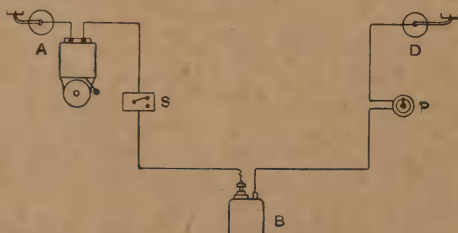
One-wire Method, Gas Piping Forming Part of Circuit
